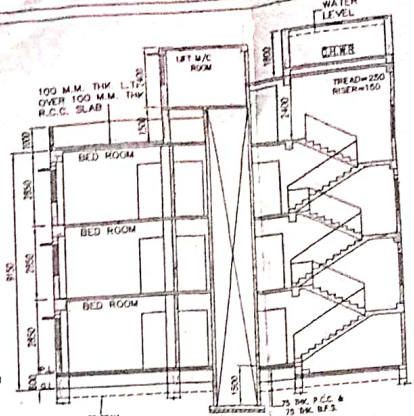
DETAILS OF FLOOR PLANS, SECTIONS, ELEVATIONS, SEPTIC TANK, CHLORINATION CHAMBER, & SITE AND S.B.G. TANK.
